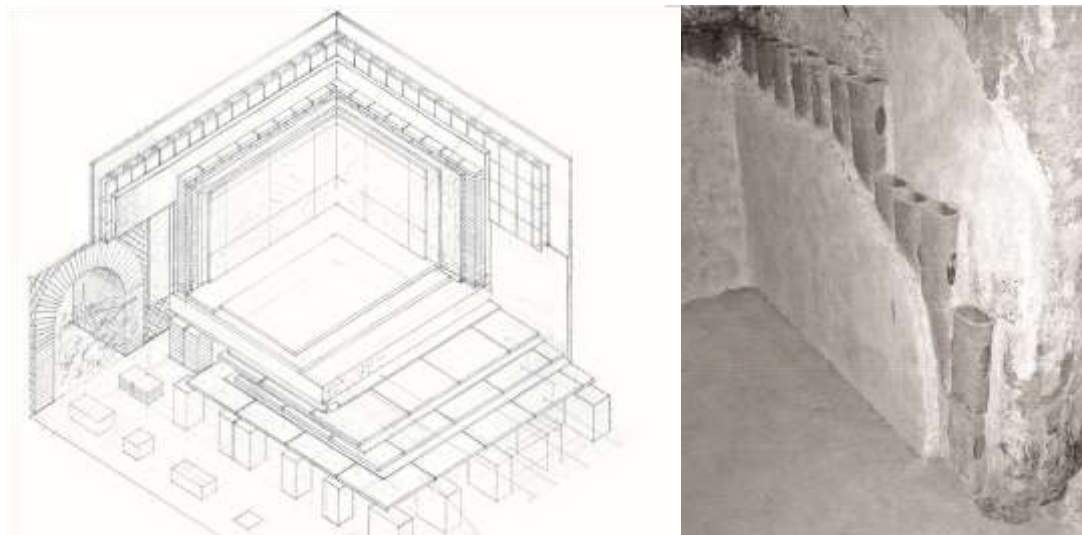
°. Heating system, with small brick columns underneath the pavement and walled tubules: graphic scheme and terracotta pipes of sizeable width with joints still in place.
